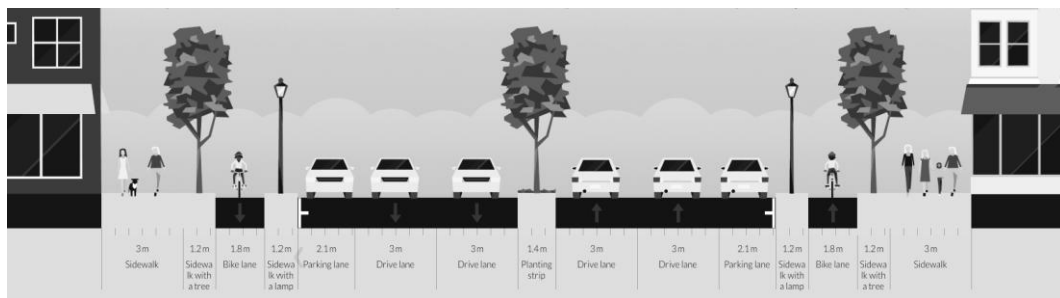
Street width: 32 m. Street consisting of sidewalks, bike lanes, space for greenery, drive lanes and parking lanes. Designed with streetmix.net.
